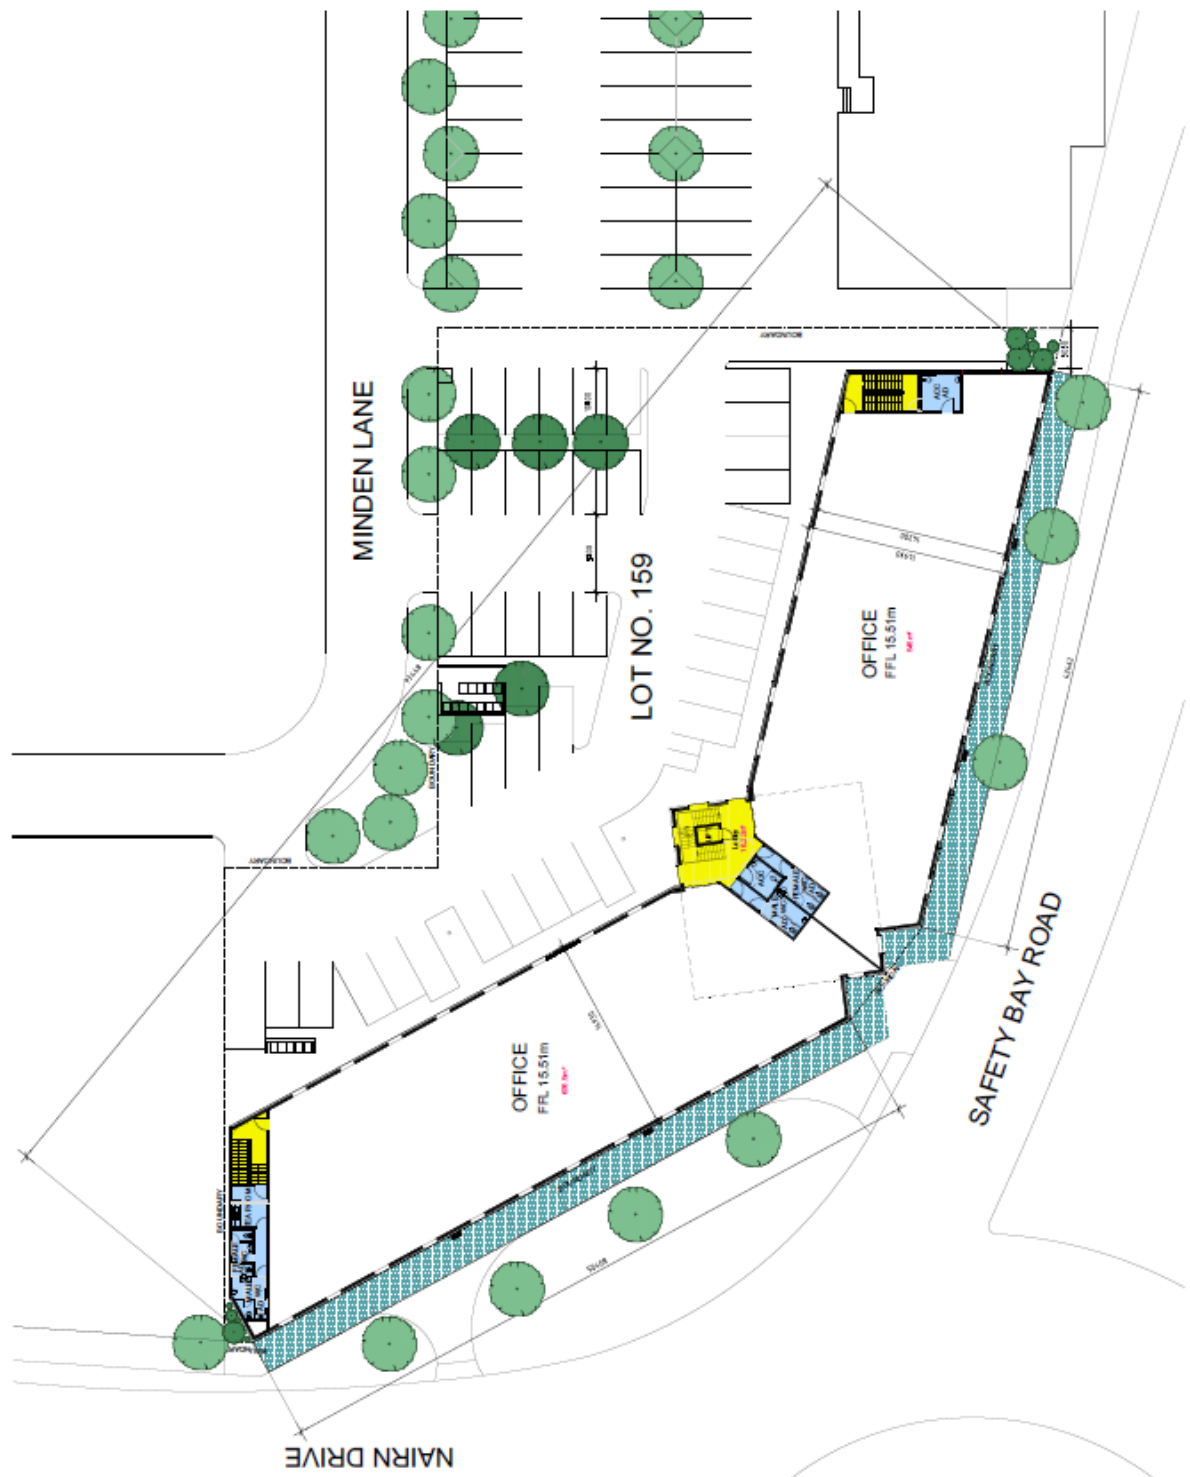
Revised (Current) First Floor Plan (11.12.2015)
